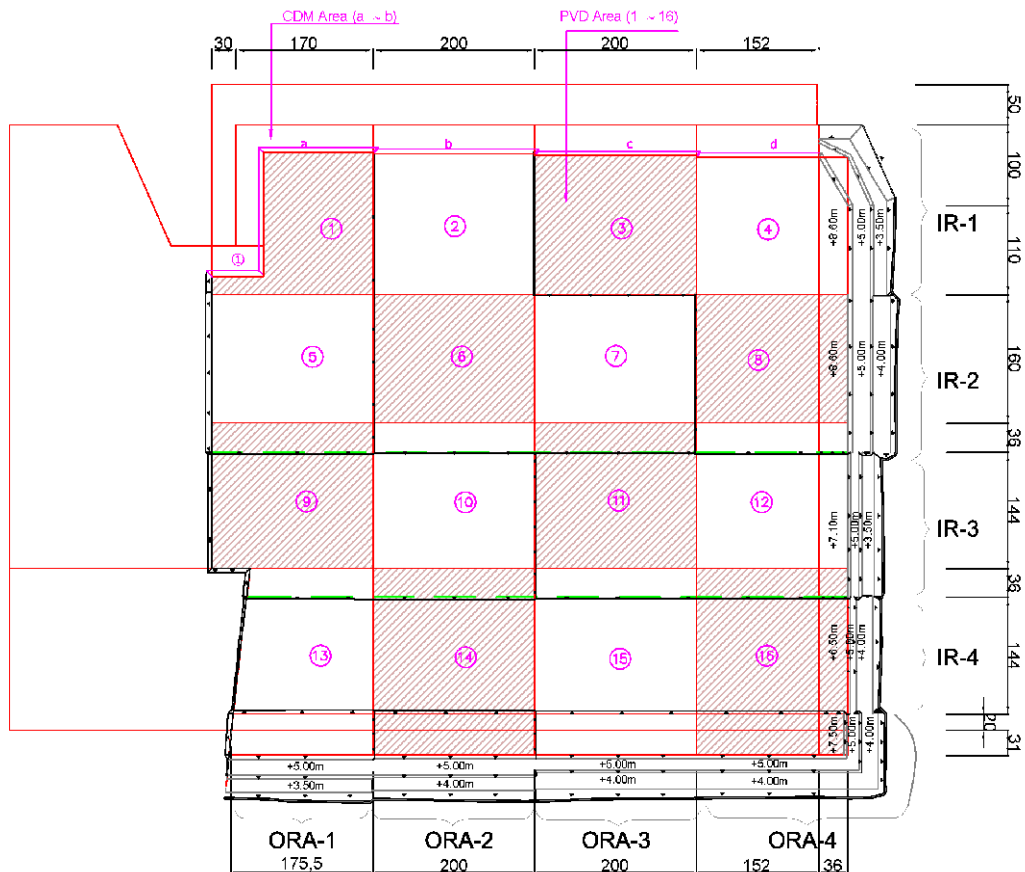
Blocks and Sections for Reclamation Area and Revetment Area
